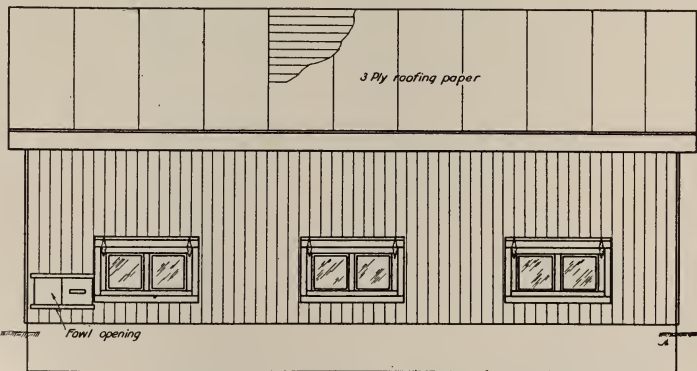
Rear view of a 20-foot unit of the commercial laying house, showing location of windows and fowl door and method of laying roofing paper. See text for discussion on rear windows and figure 17 for detail of fowl opening.
